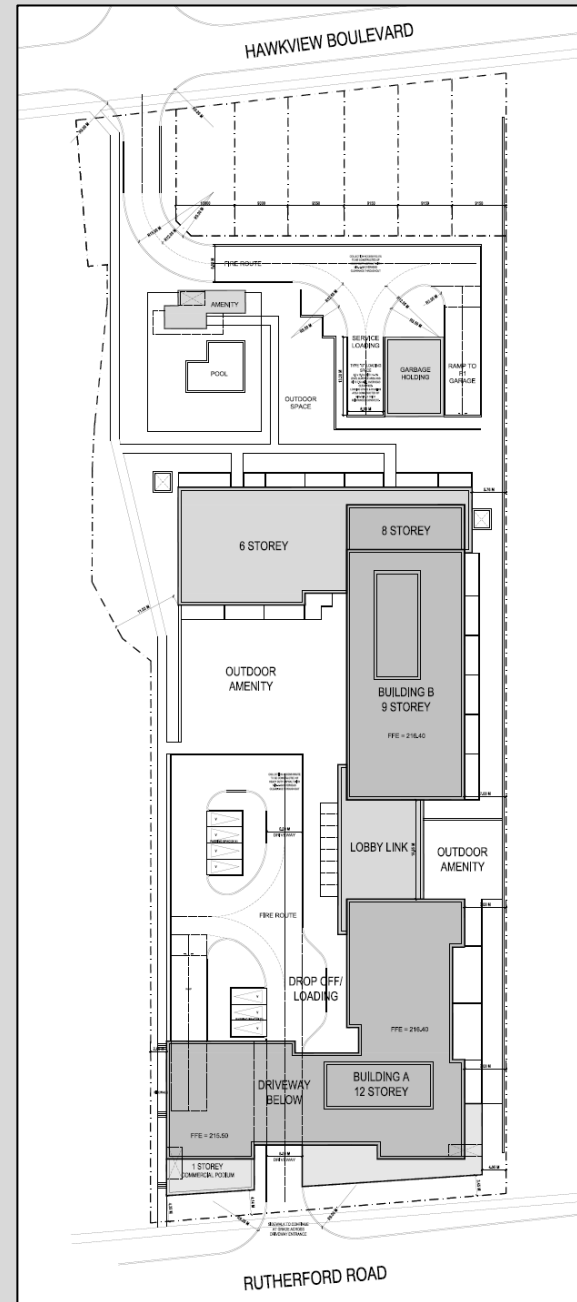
Site Plan (Re-Submission, June 1, 2021)
